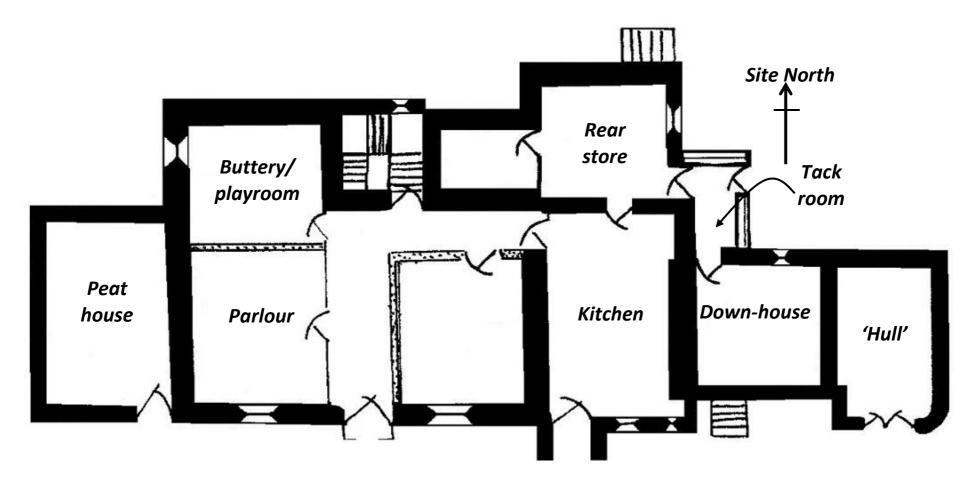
Plan of the Farmhouse at ground floor level to show layout and arrangement of the rooms (after Louise McArthur)
